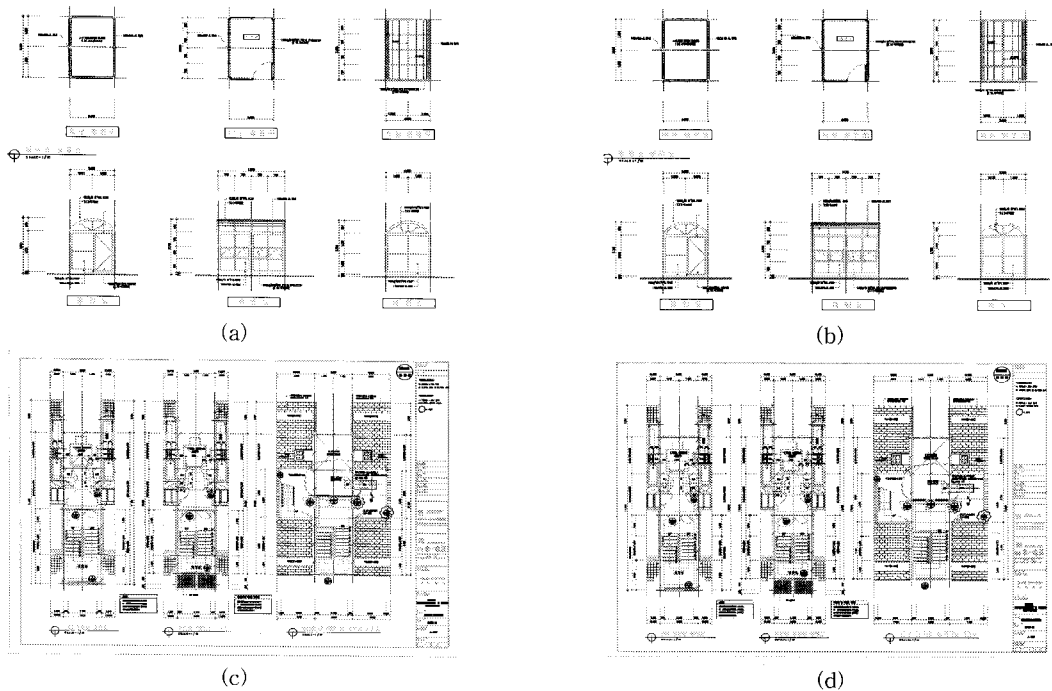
(a) original and (b) line watermarked *building external form drawing*, (c) original and (d) arc watermarked *Stair section-detail drawing*.
